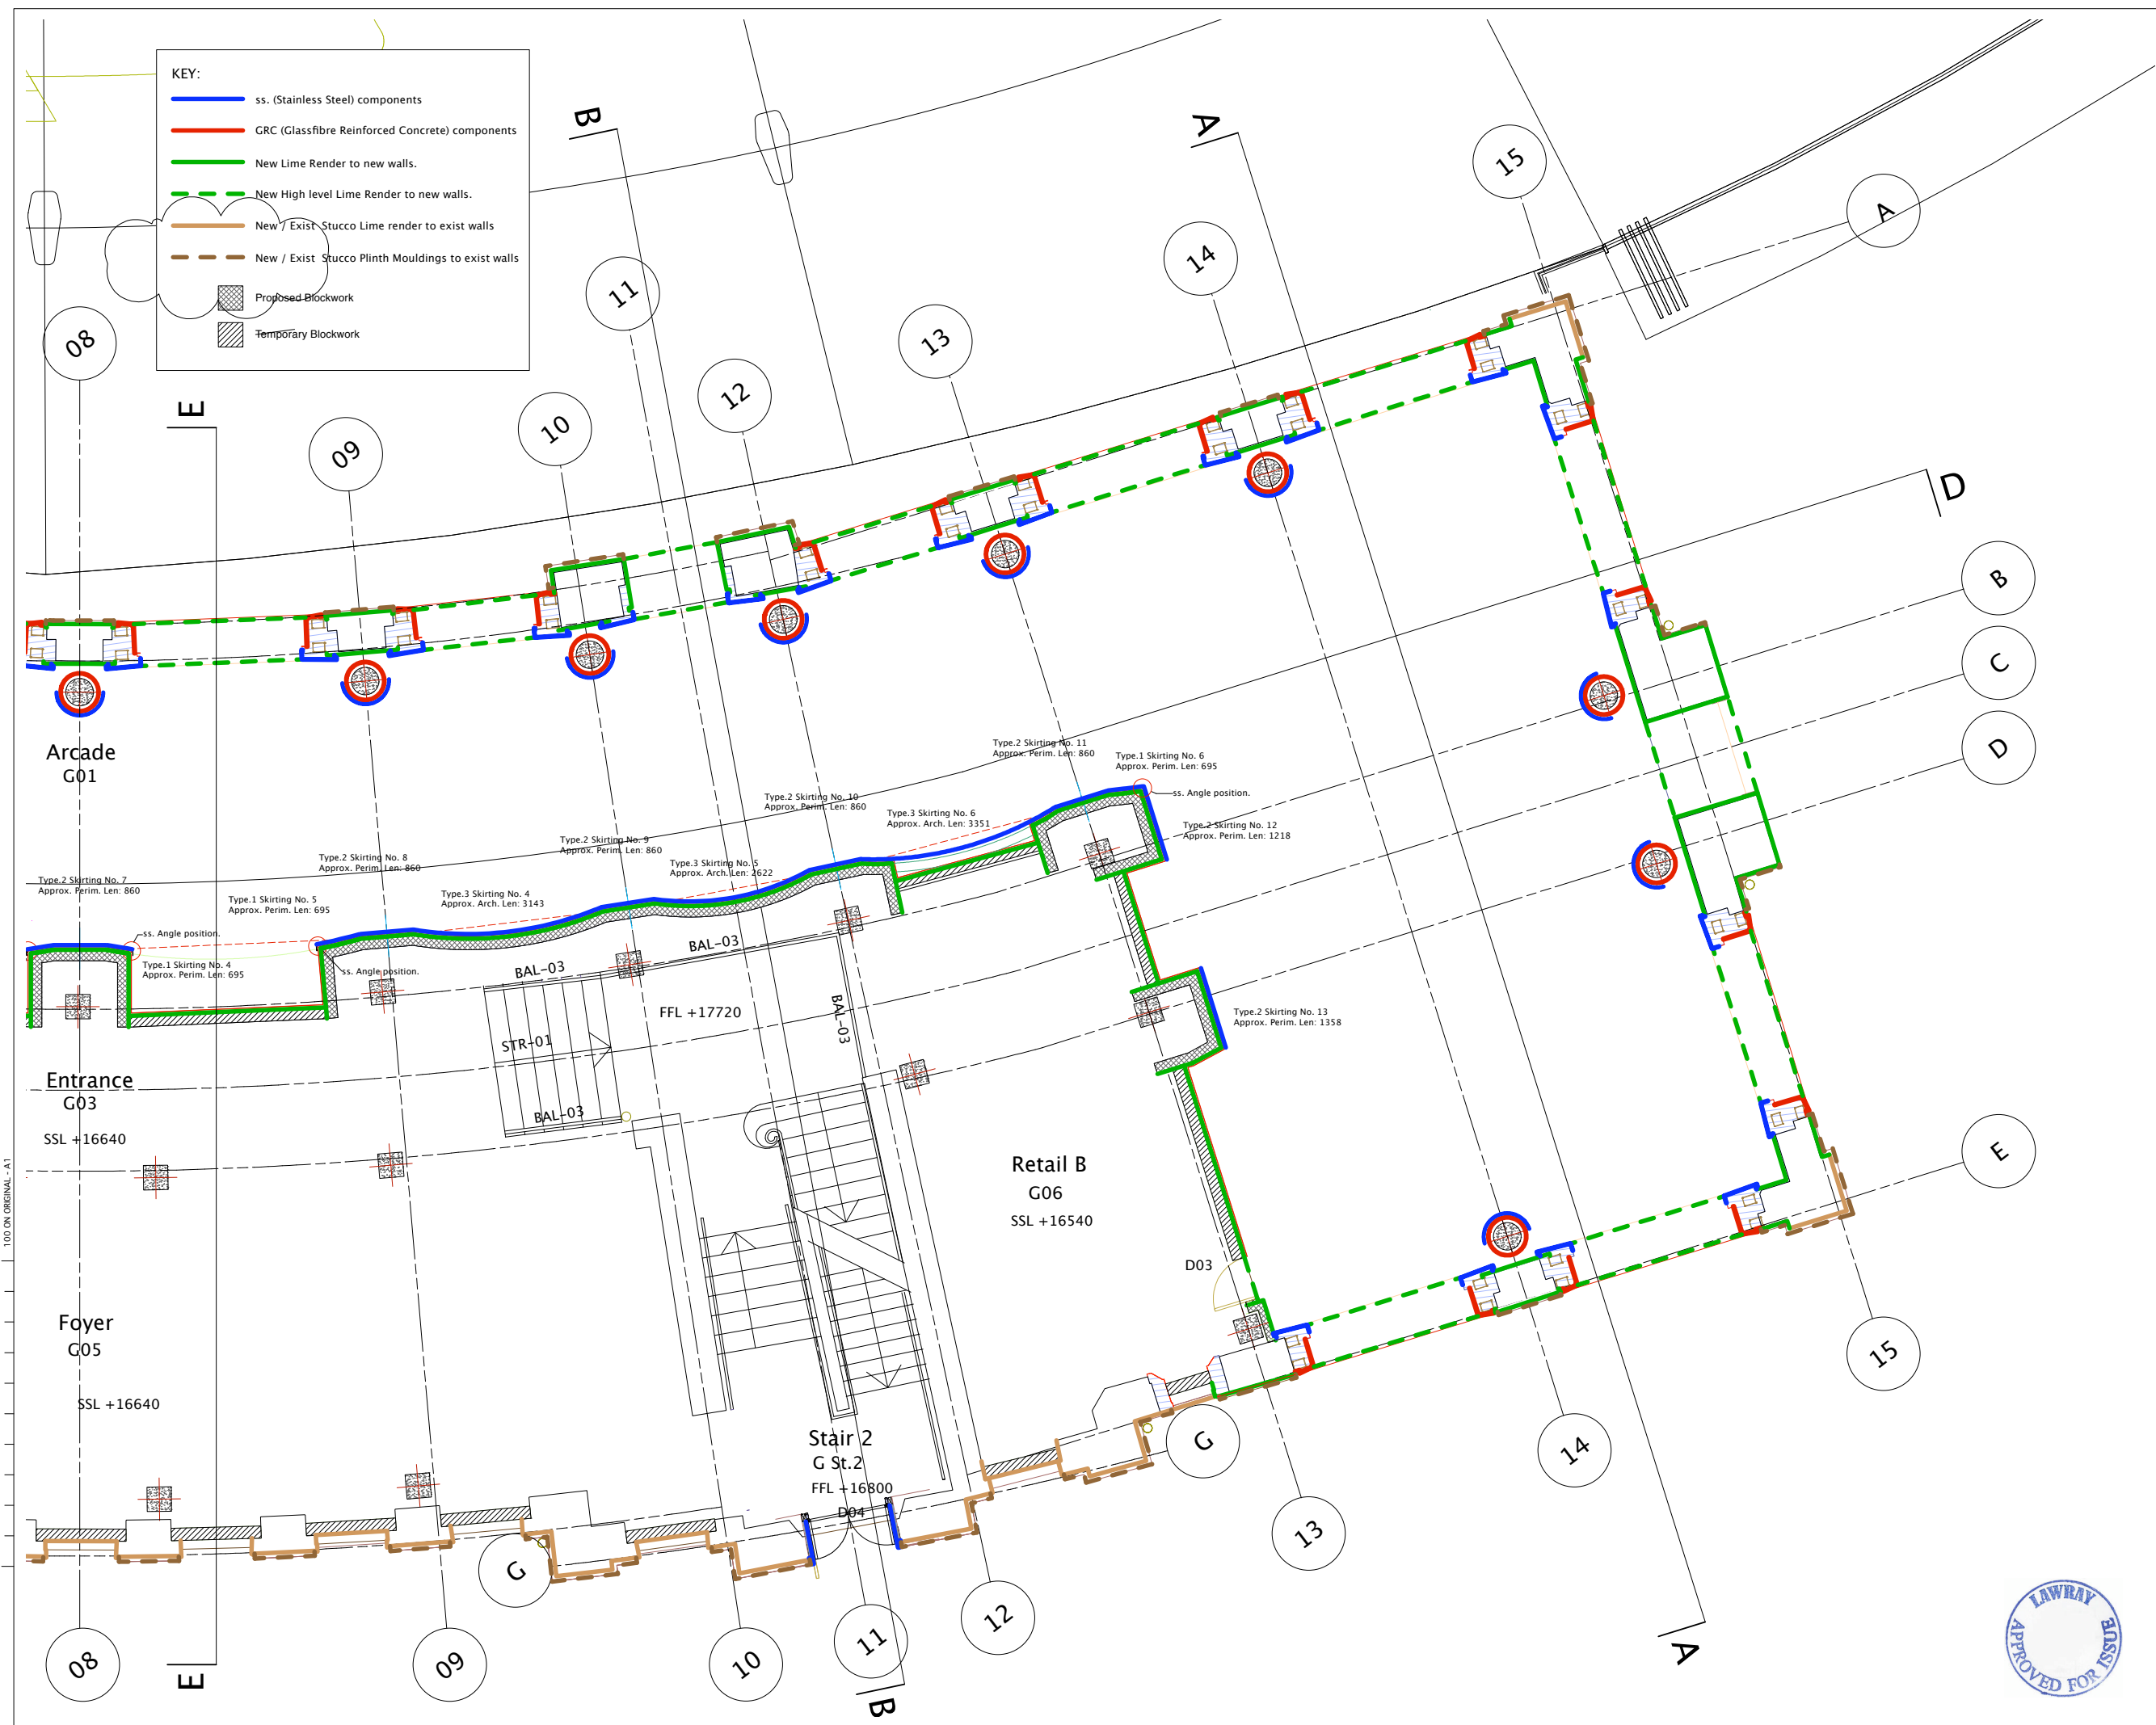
04_812/1	Sheet 1 of 2	Rev. E
